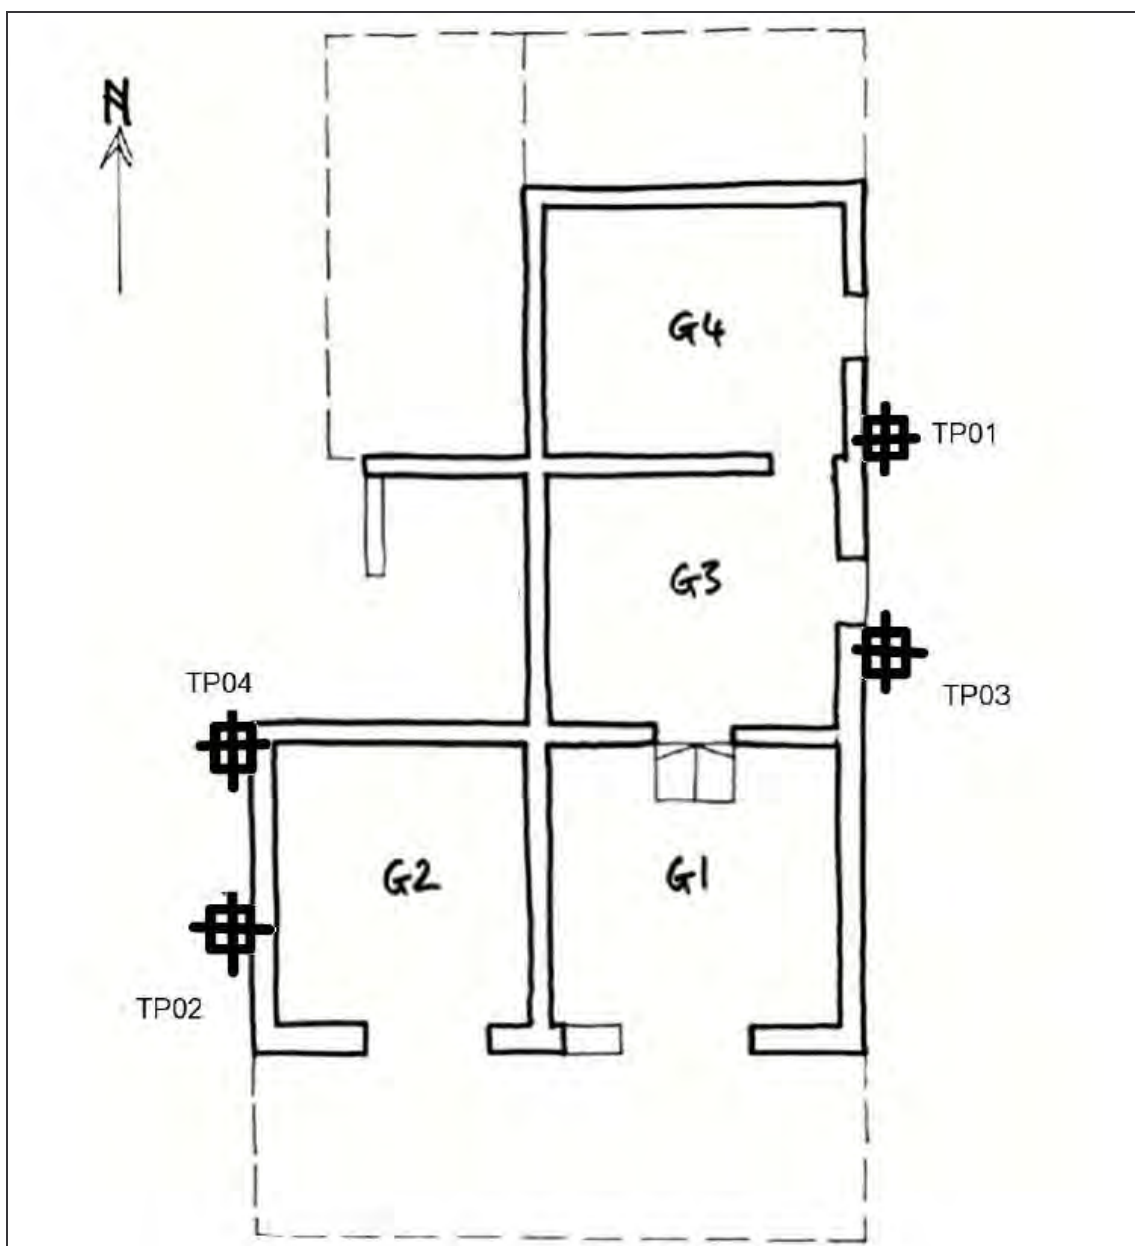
Proposed location of the four trial pits (supplied by Capstone Consulting Engineers)
